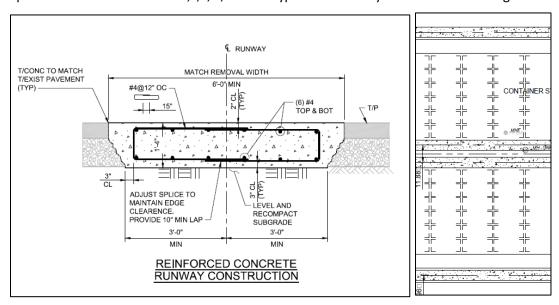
TYPICAL RTG RUNWAY CROSS SECTION AND PLAN VIEW DETAIL 24
